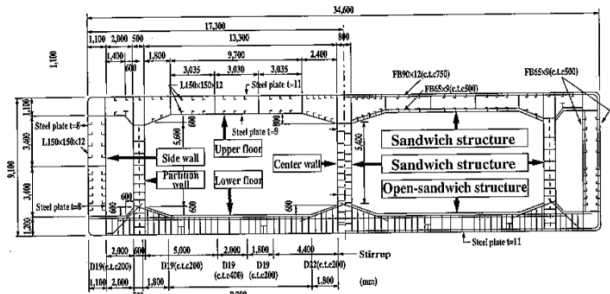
Cross section of Minatomija Immersed tunnel (Kimura H. et al. 2002).
